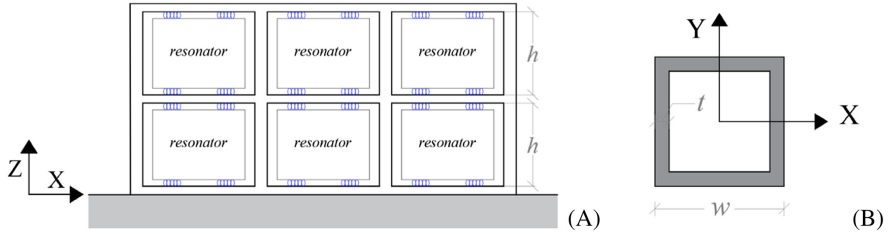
Two-layer metafoundation: (A) cross section of the foundation; (B) cross section of a steel column.
